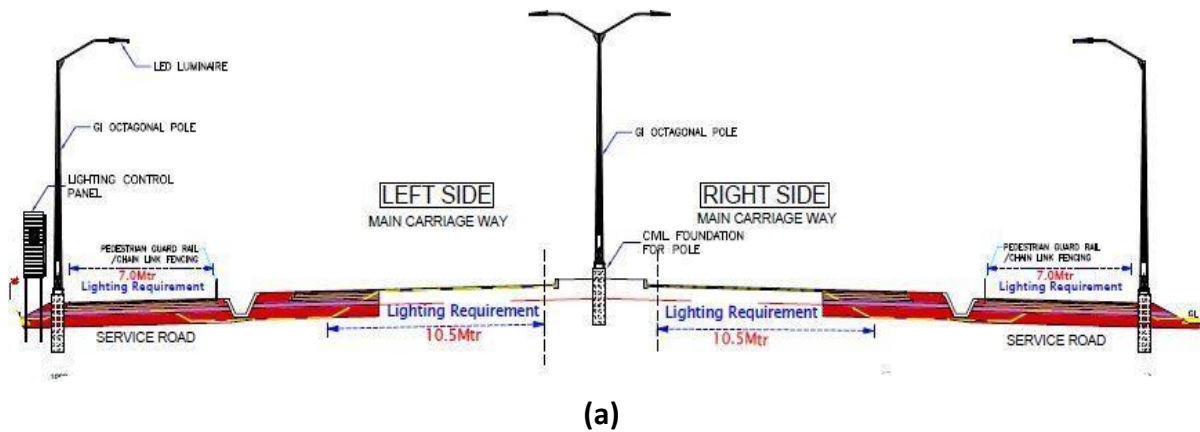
(b) shows typical cross sections for a typical 6 lane divided carriageway in plain terrain with service road on both sides and with raised median.
